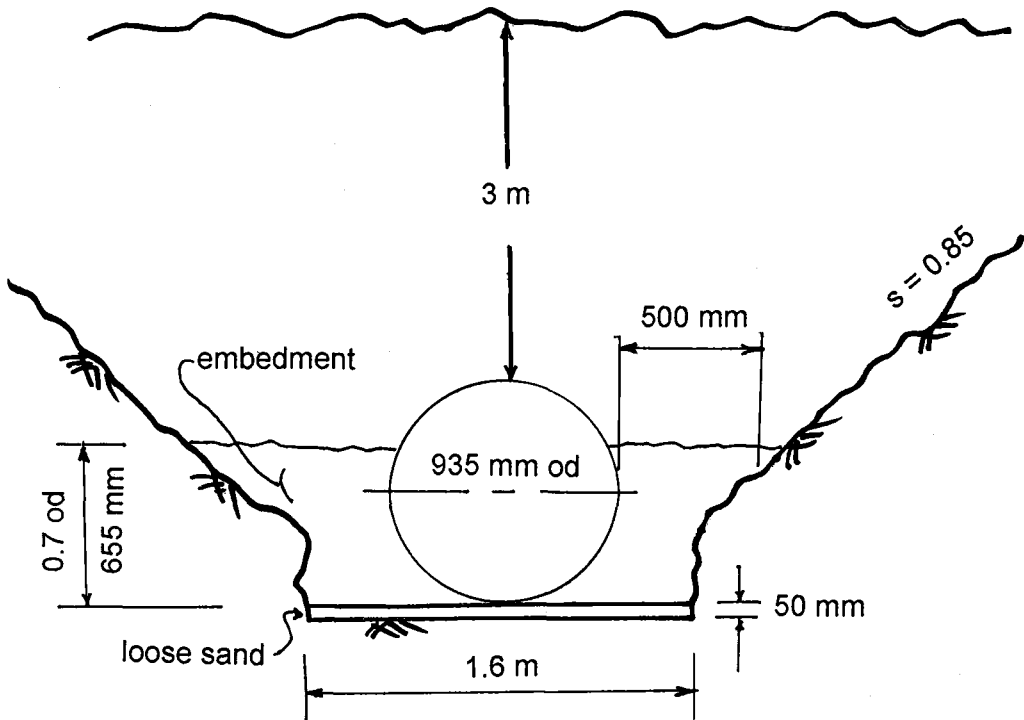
Typical Trench Dimensions and Cross-Section
